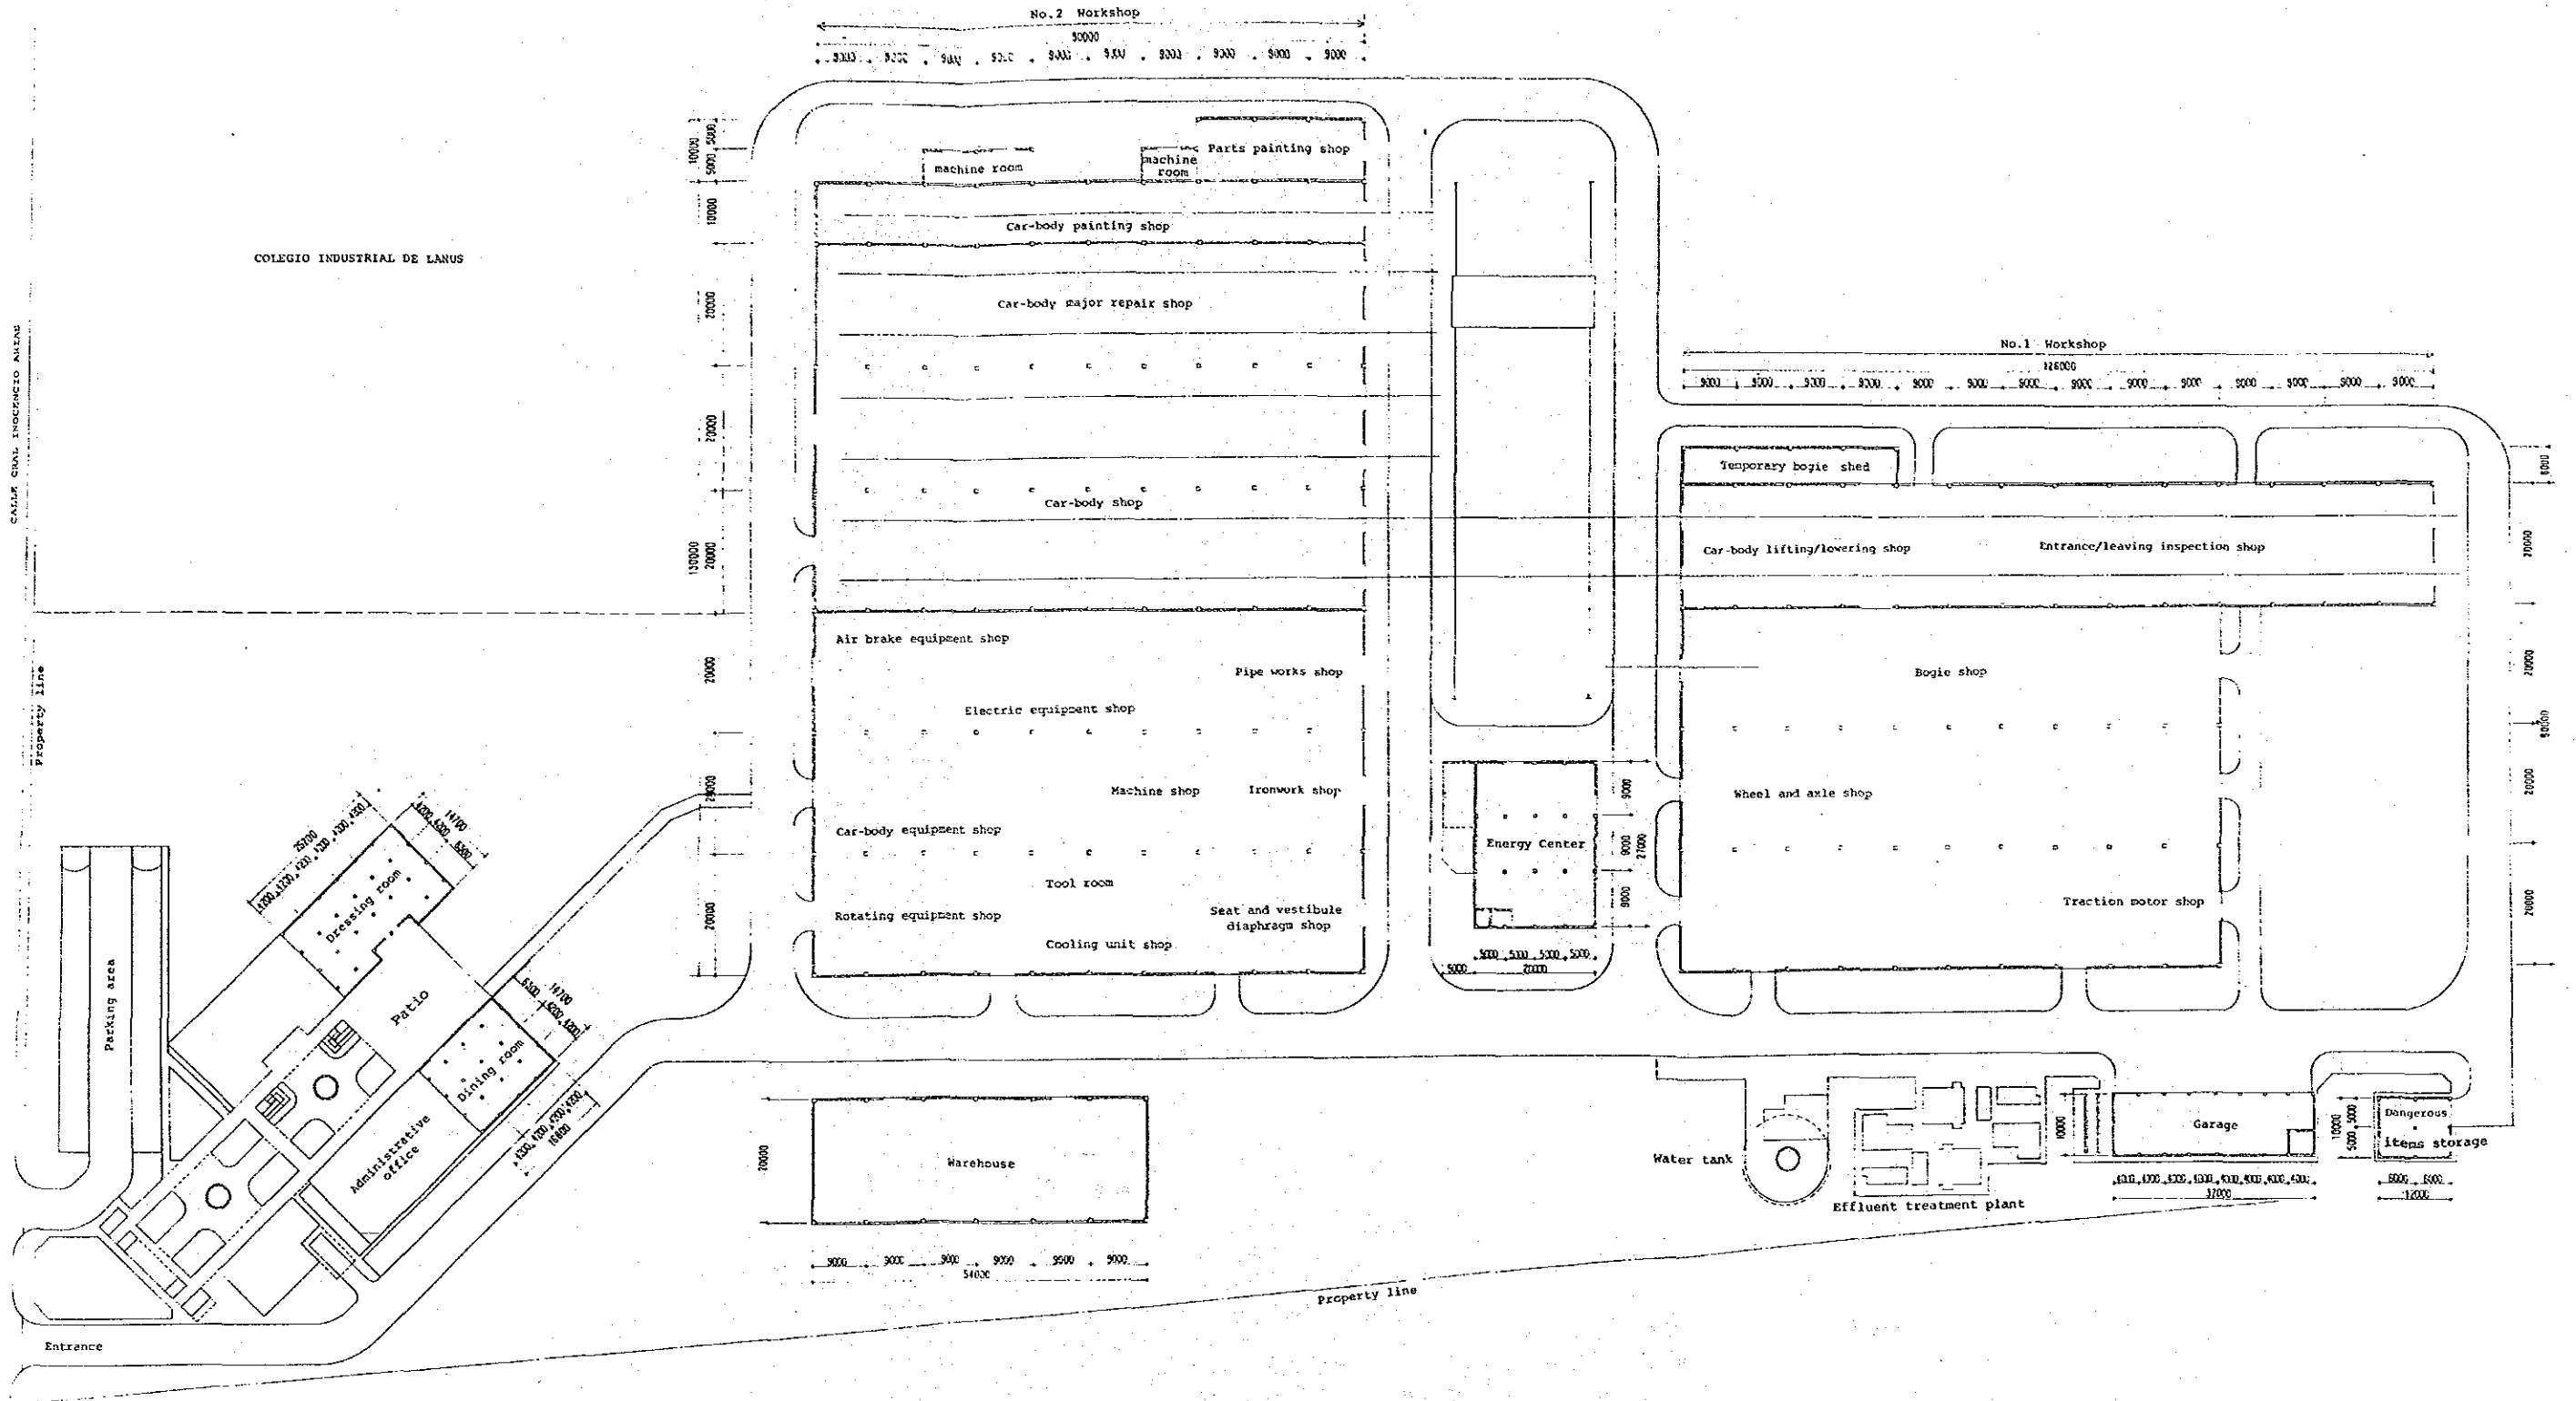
Layout of KM 10 Workshop Buildings Proposal Ib, II
